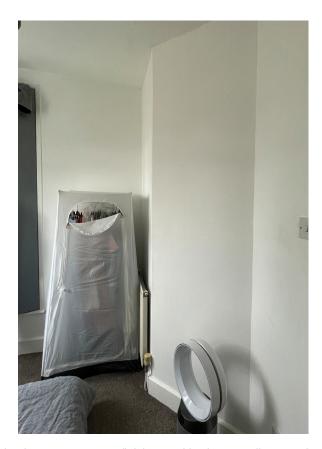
and 6: Photographs of the existing bedroom showing its current space, finishes and bedroom radiator, and the non-original partition between the bedroom and bathroom.
